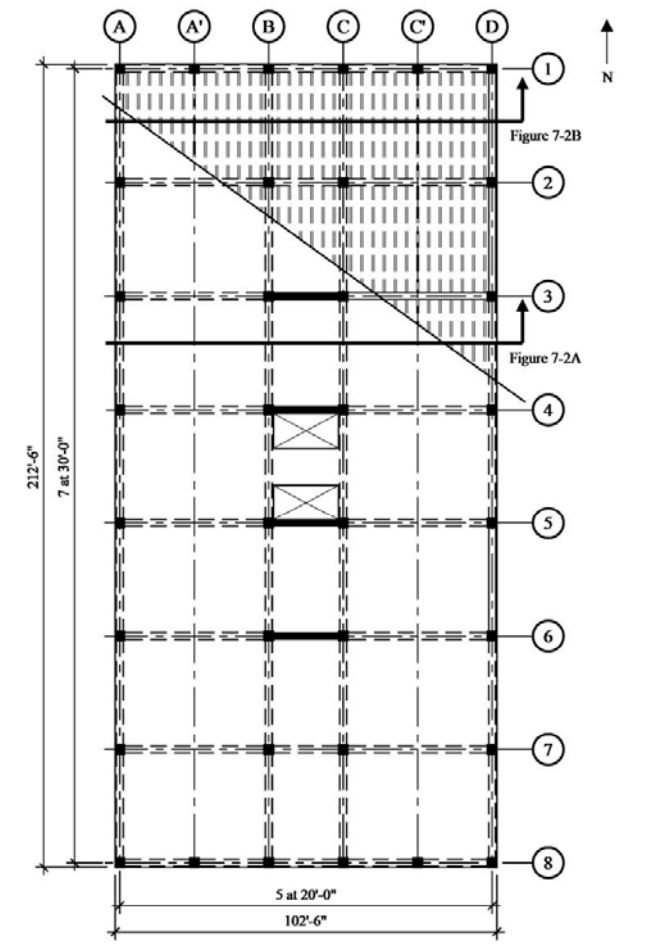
Typical floor plan of the Berkeley building; the Honolulu building is similar but without structural walls (1.0 ft = 0.3048 m)
